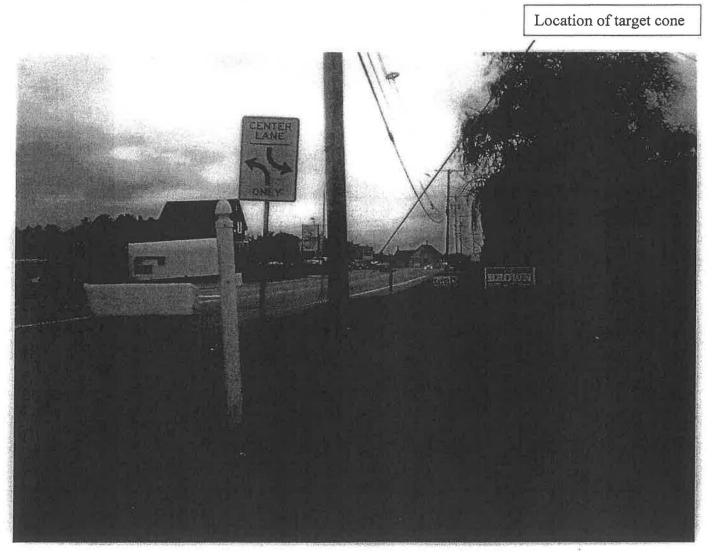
Sight distance looking south along Lowell Road toward a traffic cone, placed 400' away.
